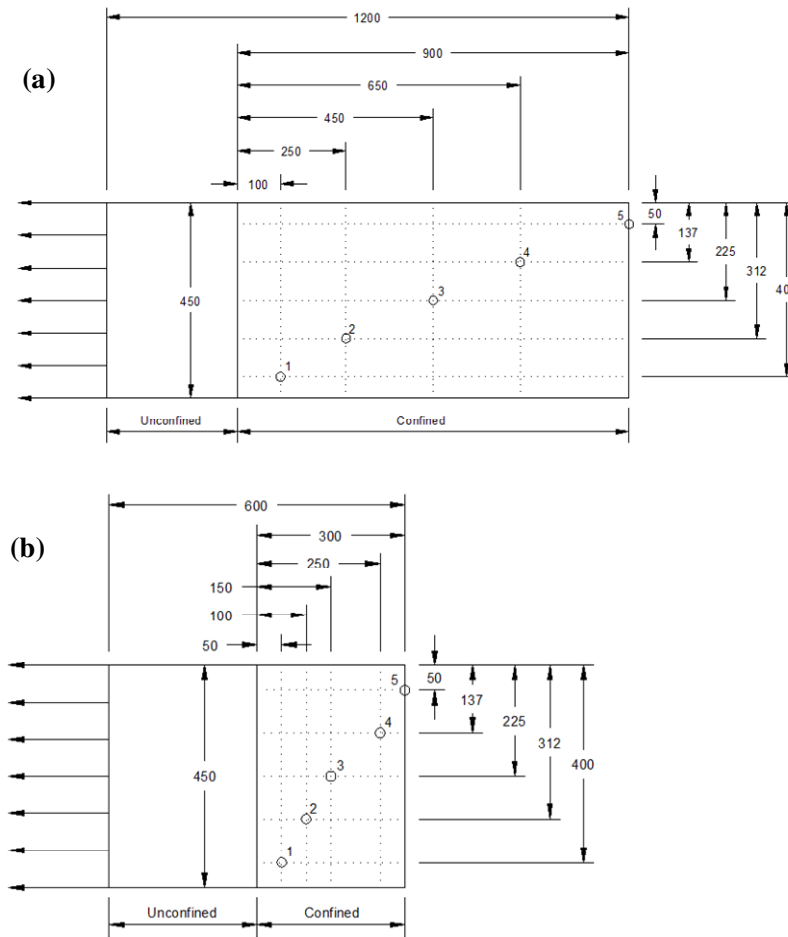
LVDT location for test I-3 and test I-4 of specimen width of 0.45 m and confined length: (a) 0.9 m; (b) 0.3 m (All dimensions in millimeters)
